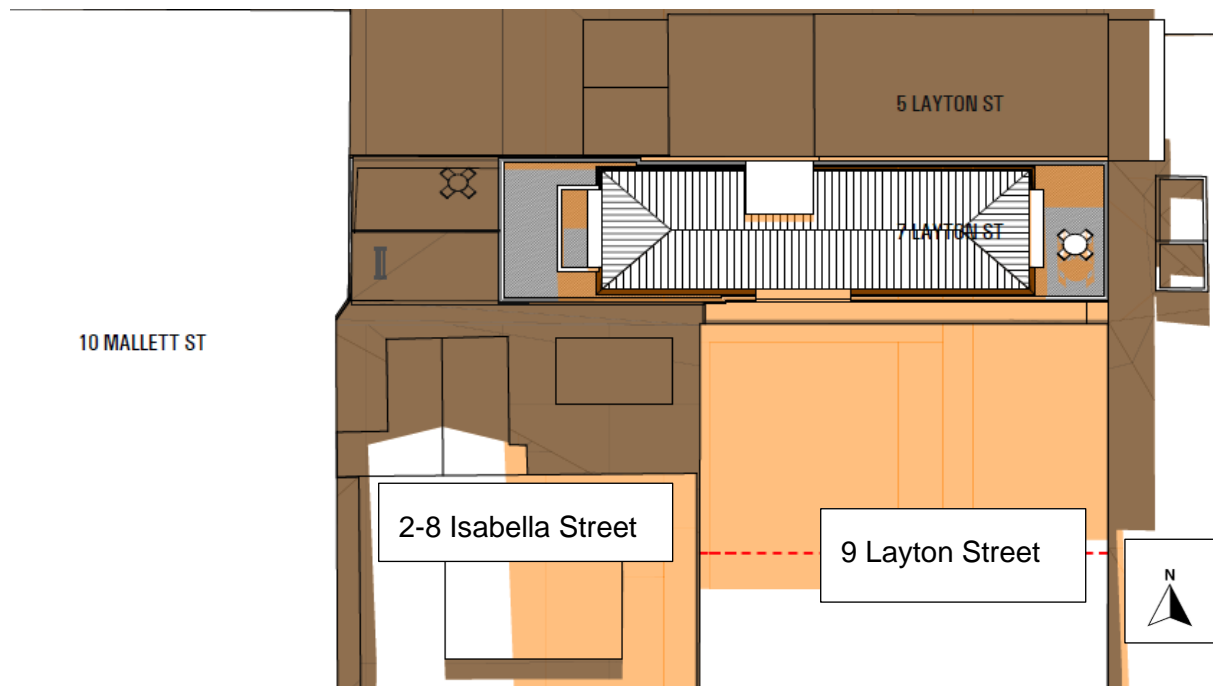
Site plan illustrating the properties where additional overshadowing occurs
